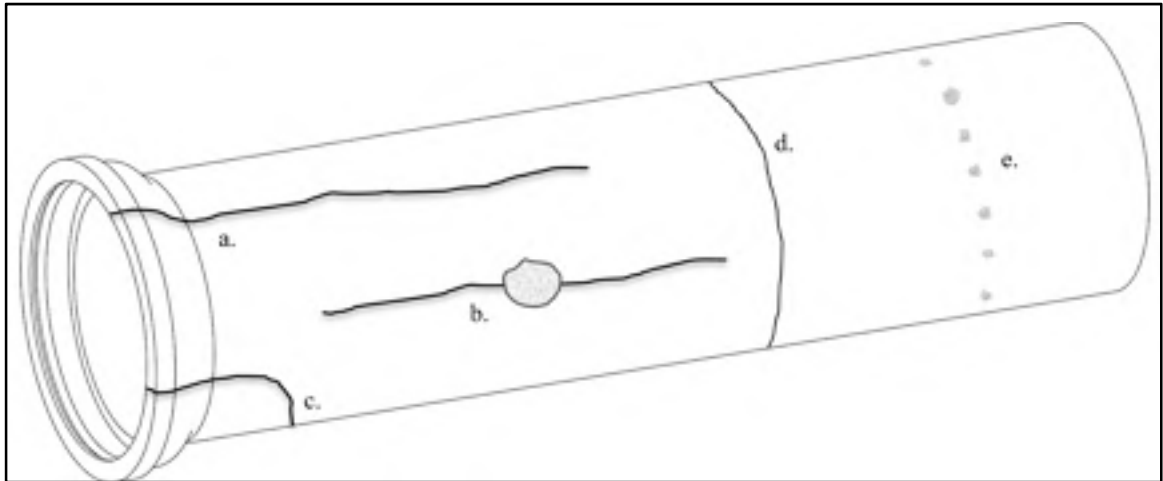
Small pipes (diameter < 380mm) failure modes. a. axial crack initiated at the bell, b. axial crack initiated due to corrosion pitting and pipe wall thinning, c. bell splitting, d. circumferential cracking, e. chain created corrosion
